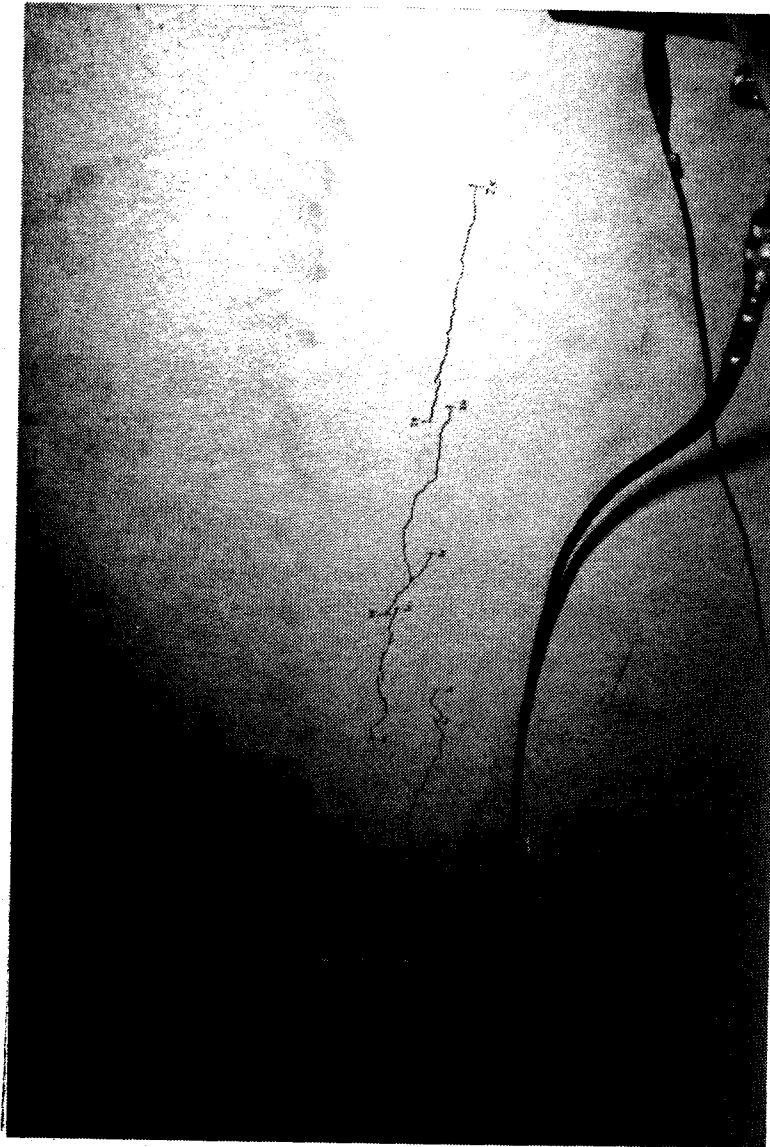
Longitudinal cracks in slab at a mid-span deflection of 235 mm
